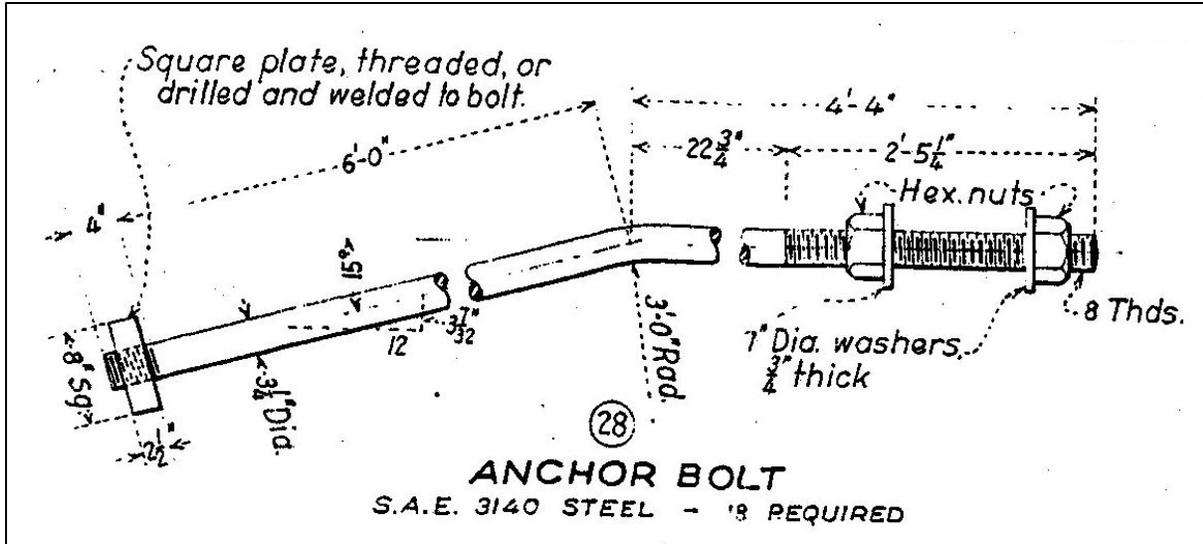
This drawing shows typical anchor bolt detail. The anchor bolt is over 10 feet long and 3.25 inches in diameter. Some bolts are straight.
